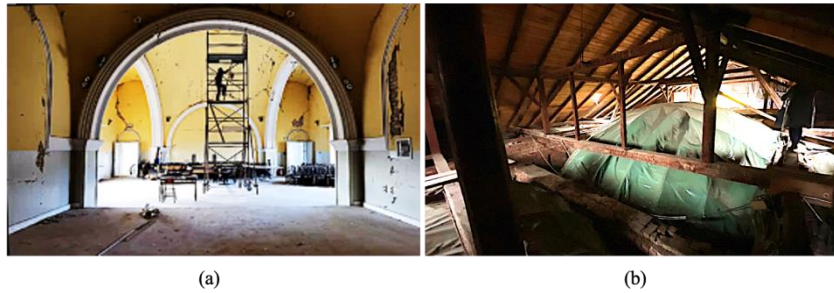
The first floor (view towards West) damaged by the December 2020 earthquake (a) and attic with upper surface of the main timber dome (view towards West) (b)
